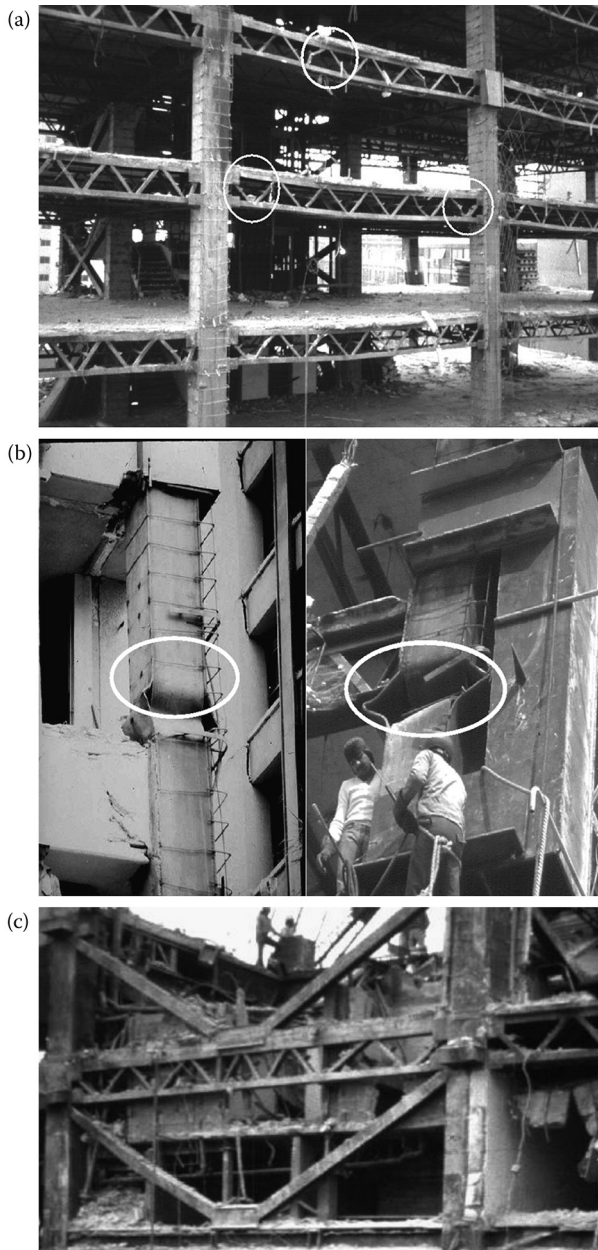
Collapse of Pino Suarez buildings: (a) buckling of truss girder members; (b) column buckling; (c) damage of bracing system. (Gioncu, V., Mazzolani, F.M. 2002: *Ductility of Seismic Resistant Steel Structures*. Spon Press, London; USGS, nd.)
